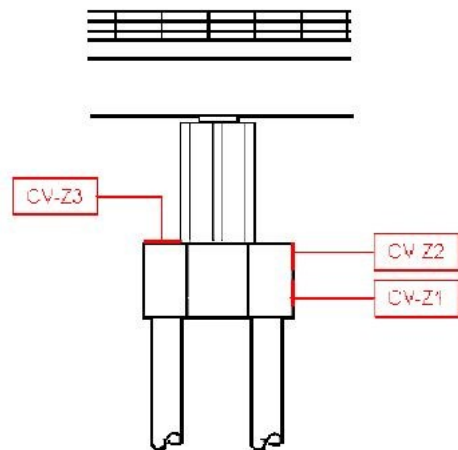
Location of zones Z1 to Z3 on the caisson 38
